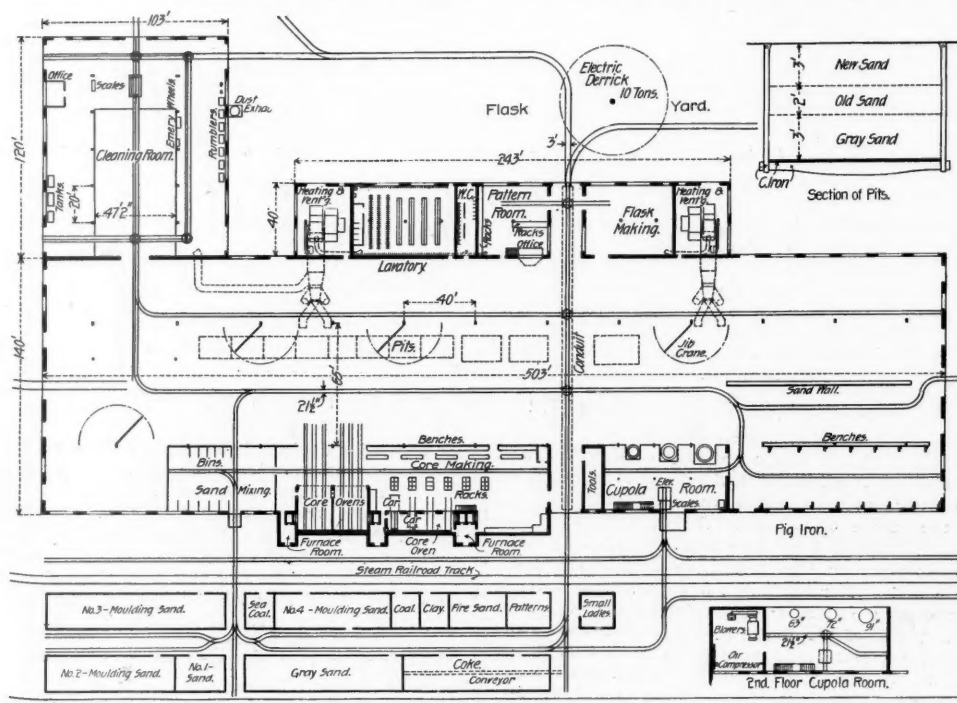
Floor Plan of General Electric Company's Iron Foundry at Schenectady.
